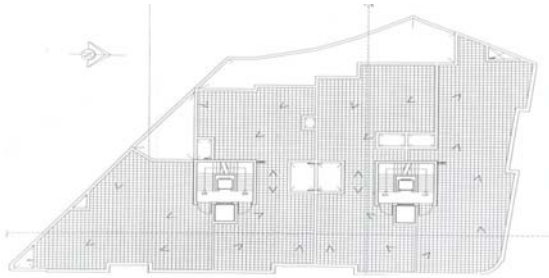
Roof plan of Tal-Ftieh Building (420 m<sup>2</sup>).
